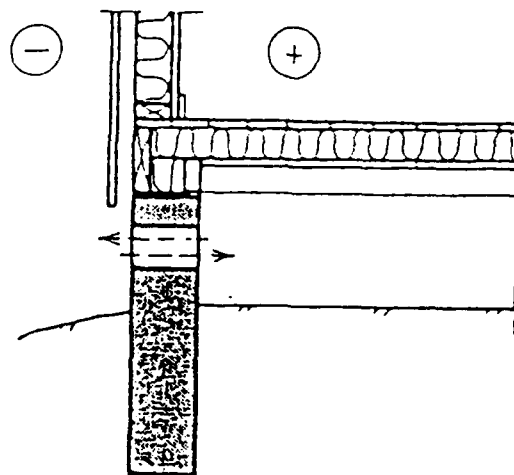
A 'cold' crawl space ventilated with outside air, usually through openings in the foundation wall.
